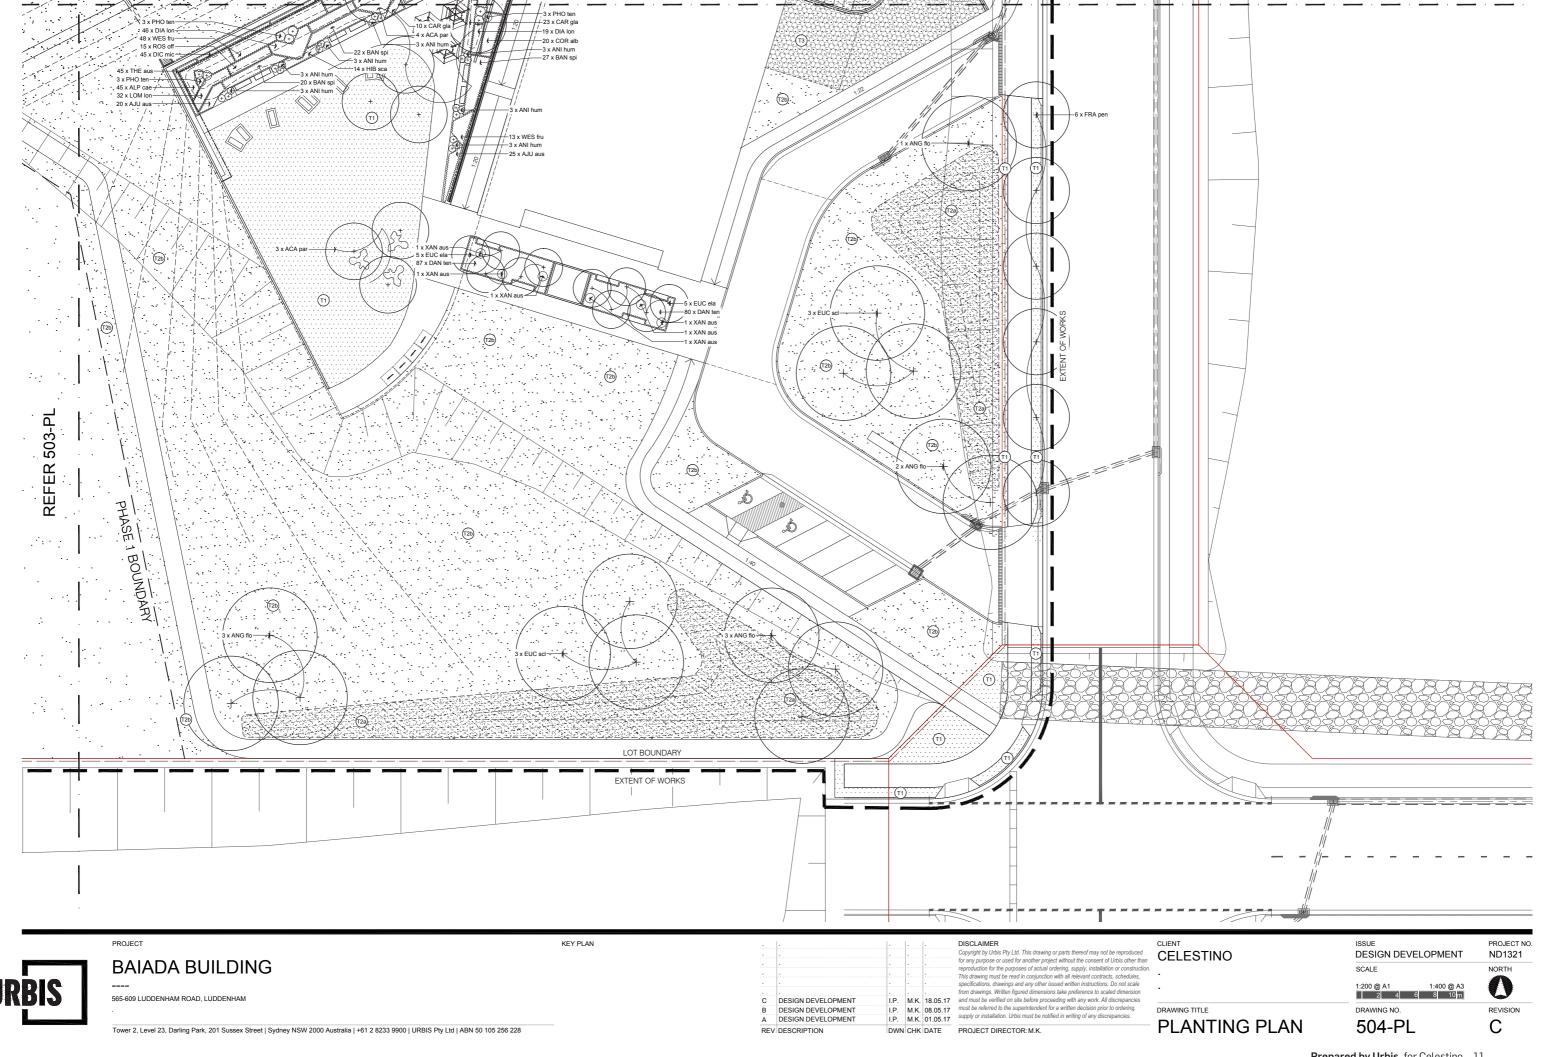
DETAIL PLAN C - STAFF GARDEN & SITE ARRIVAL
